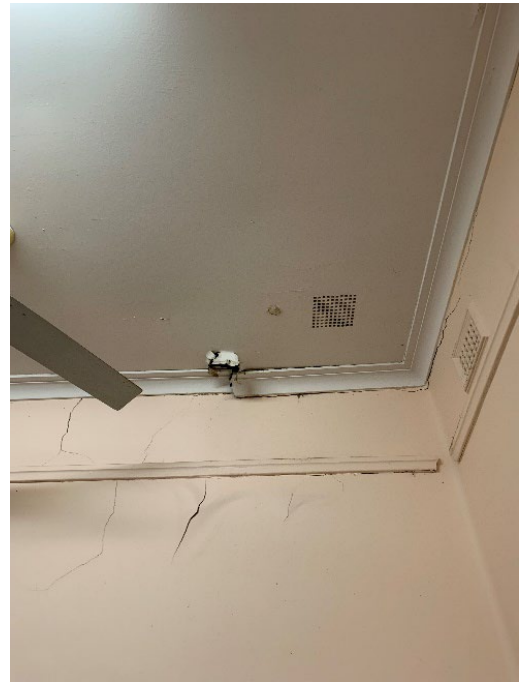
Cracked ceiling and walls, southern room, due to subsidence (2024).
